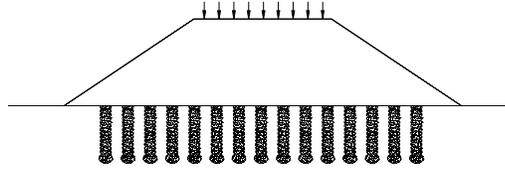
Geopier reinforcement of soils beneath embankments and retaining walls
